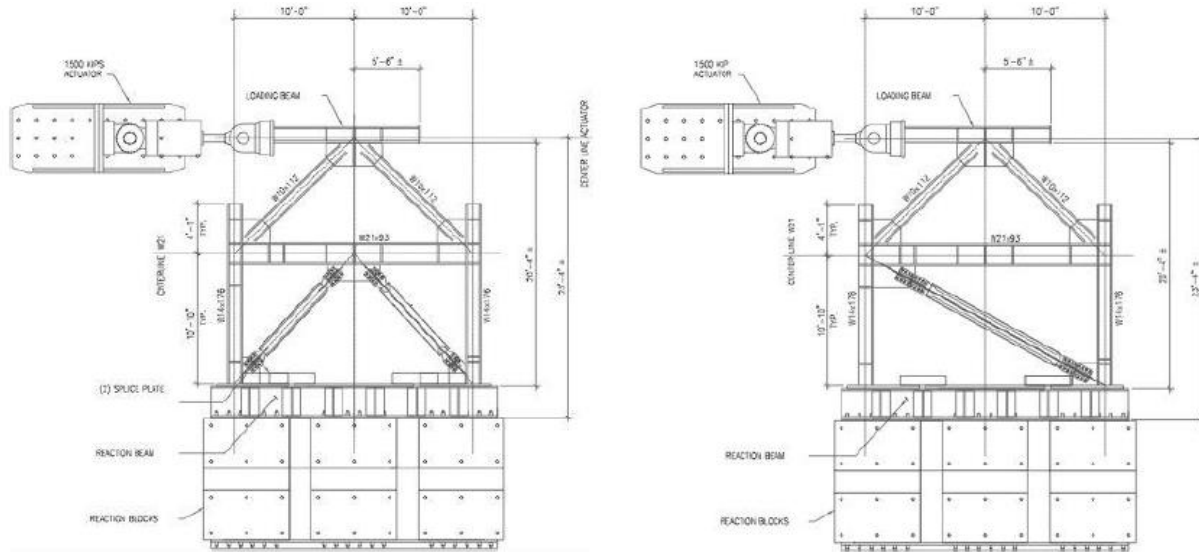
Test Set-up for BRB Specimens (Left: Test for Specimen No. 1; Right: Test for Specimen No. 2 and 3) [Mahin, 2004]
